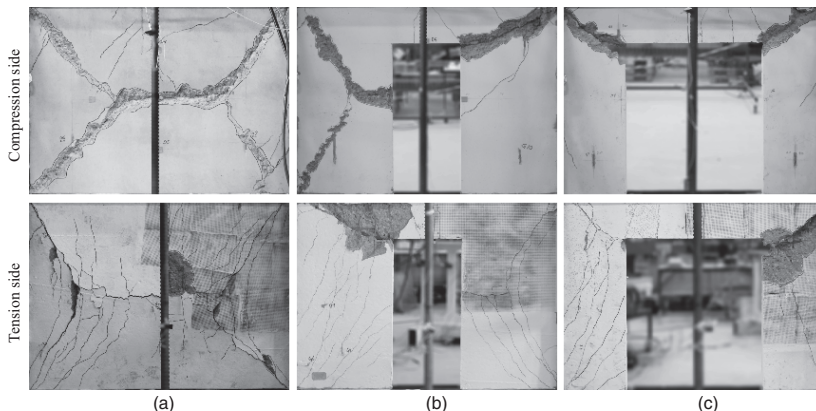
Crack pattern and failure mode of the unstrengthened specimens (reprinted from Popescu et al. 2016): (a) Specimen I-C; (b) Specimen I-S; (c) Specimen I-L
